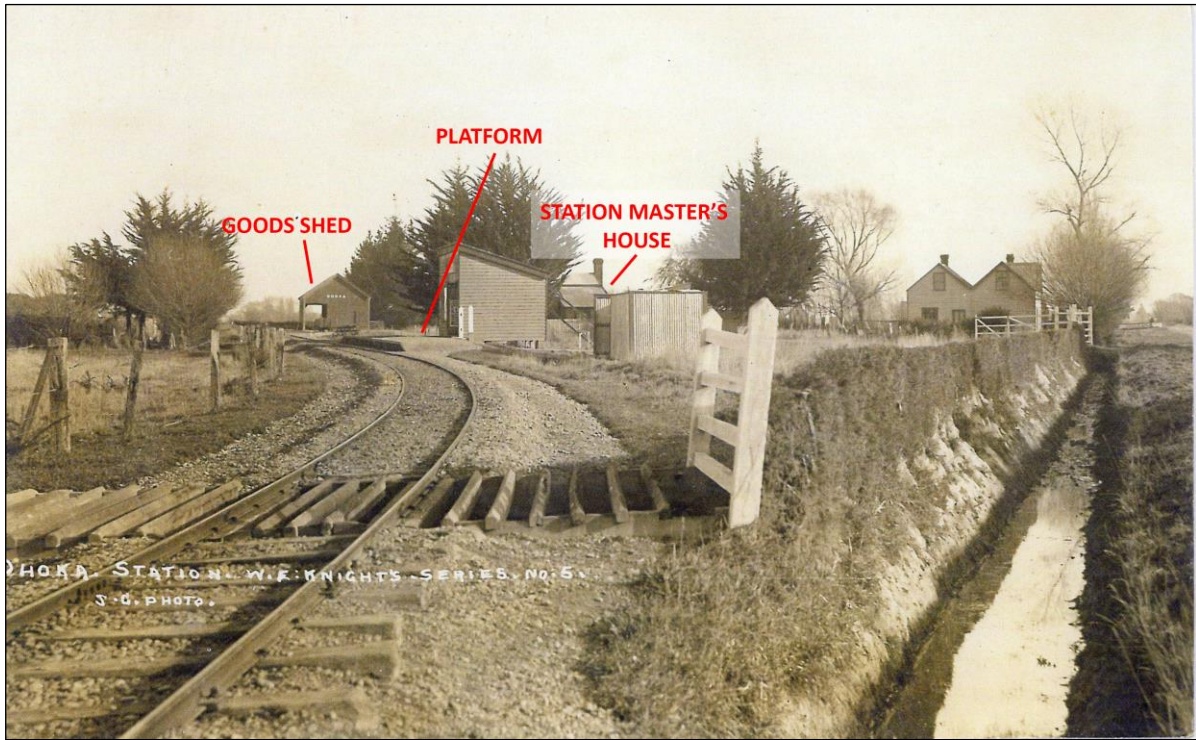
View from Mill Road looking west towards the Bradley Road intersection, with no specific date, but likely early 20th century. It is possible to see the drain along Mill Road and the first Methodist parsonage to the right of the railway. The station master's house is visible near the centre of the image behind the station building, and the goods shed to the left. The rail line sits within a low gravel embankment. Image: Knight, n.d.
